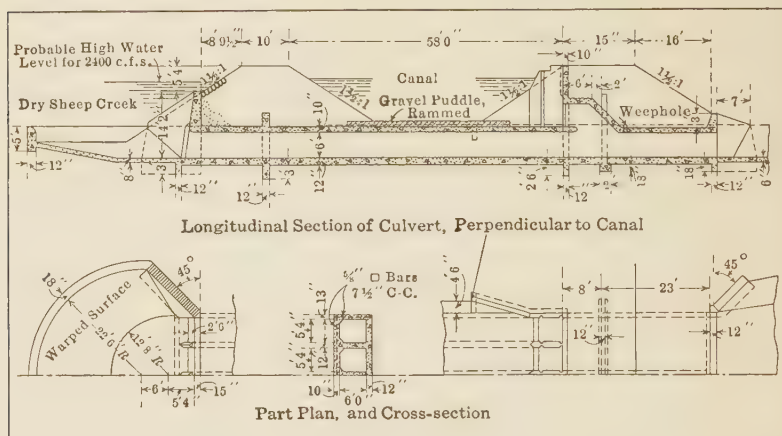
Dry Sheep Creek culvert on Interstate Canal. North Platte Project, Neb.
